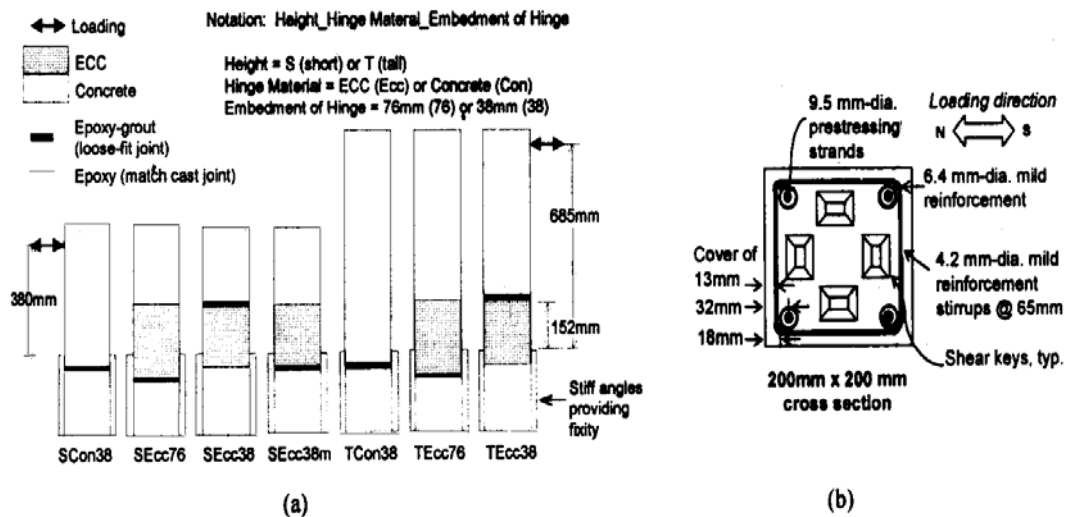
16: Schematic diagram of test specimens (a) elevation; (b) cross section from [22]
